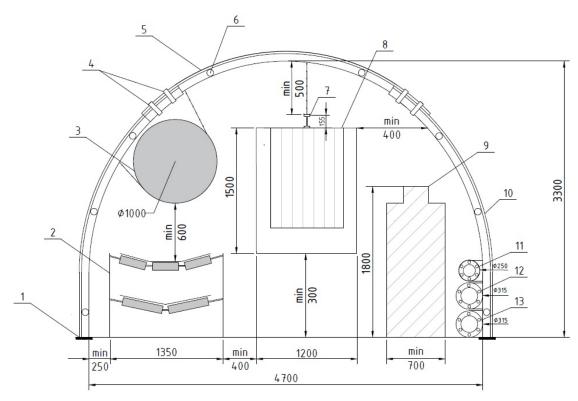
Cross-section of the roadway II: 1—support foot; 2—belt conveyor GWAREK-1000; 3—duct; 4—double yoke stirrups; 5—roof arch of the yielding support ŁP8/V29/A; 6—multi-element strut; 7—rail of suspended monorail; 8—BIZON 120-X suspended monorail; 9—passage for miners; 10—sidewall arch; 11—compressed air pipeline; 12—drainage pipeline; 13—fire pipeline.
